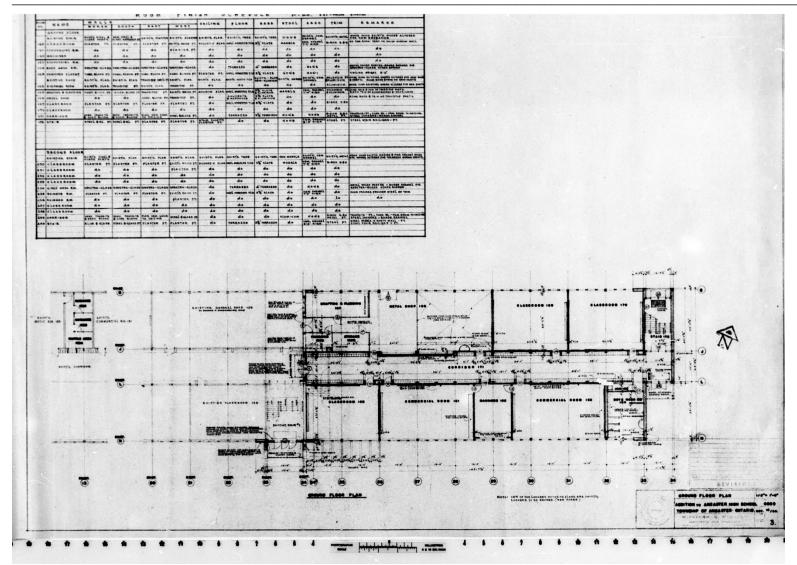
Ancaster High – McIntosh & Moeller Ground Floor Plan "New Addition" 1960 (Slide 41-38: Provided by Hamilton Wentworth District School Board Archives)
